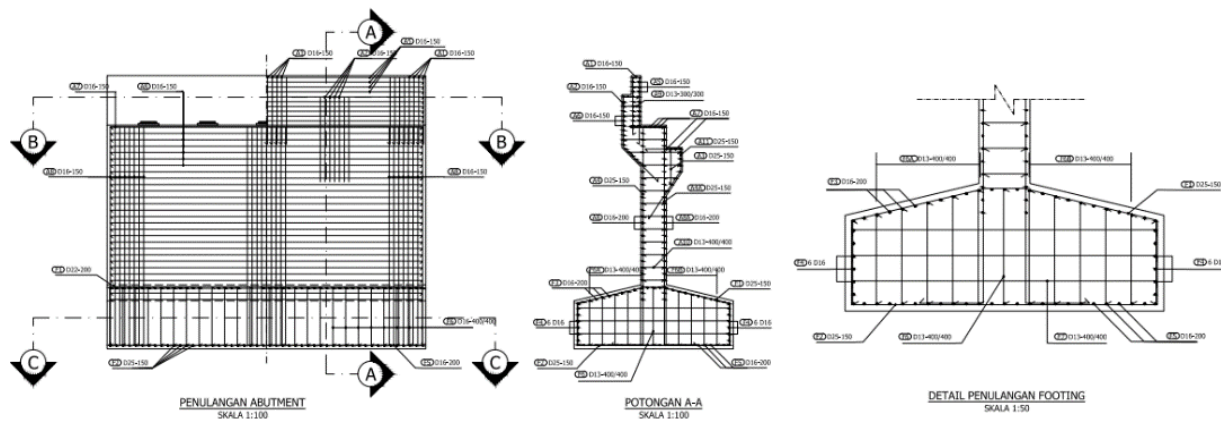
2D DED drawing of reinforcement details extracted from the 3D BIM.
